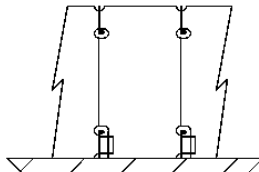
Block assembly methods 5-1e and 5-1f [2], [30]
